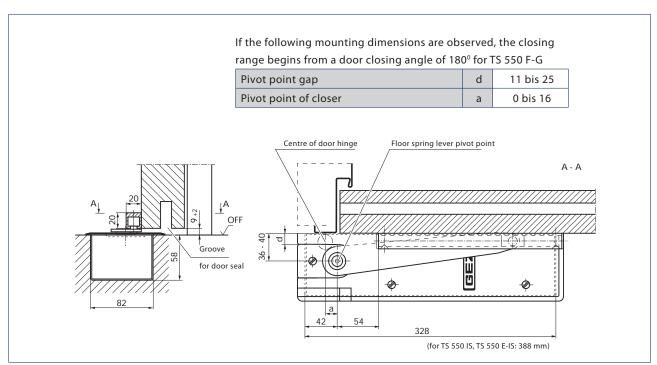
· Installation example: floor spring with lever and guide rail (surface-mounted) to a flush timber door
